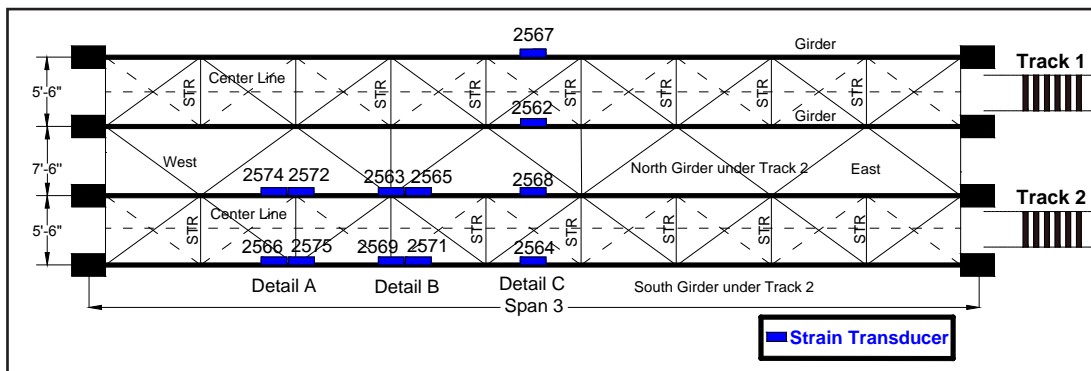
Layout of the Strain Transducers Installed in Span 3 of the Bergen County Line MP 5.48 (HX Draw) Bridge
